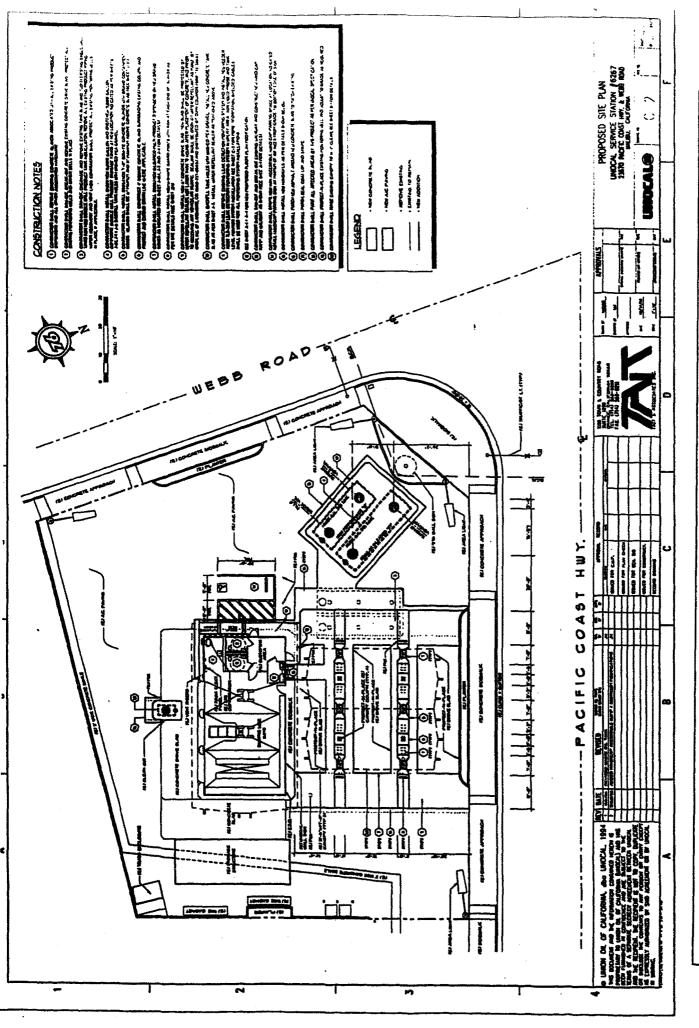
(4-97-039) Site Plan (Proposed)
